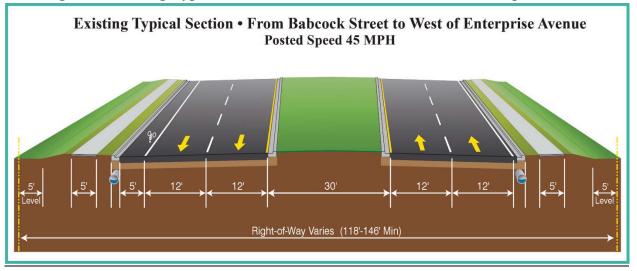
Existing Typical Section – Babcock Street to West of Enterprise Avenue
